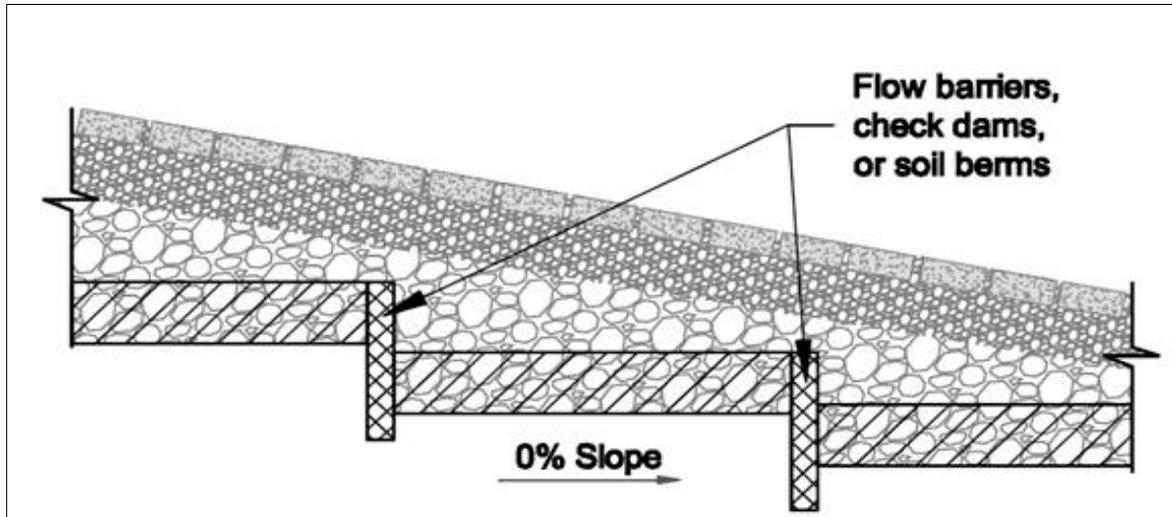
Use of flow barriers to encourage infiltration on sloped sites.
